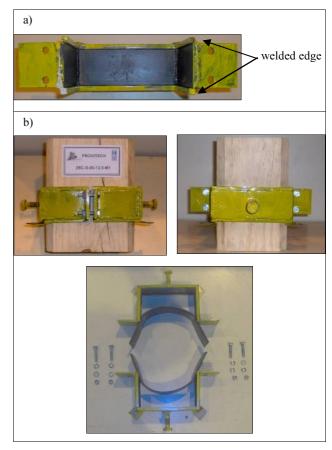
Upgraded system after preliminary tests: a) welded edges; b) 2 bolts per wing
